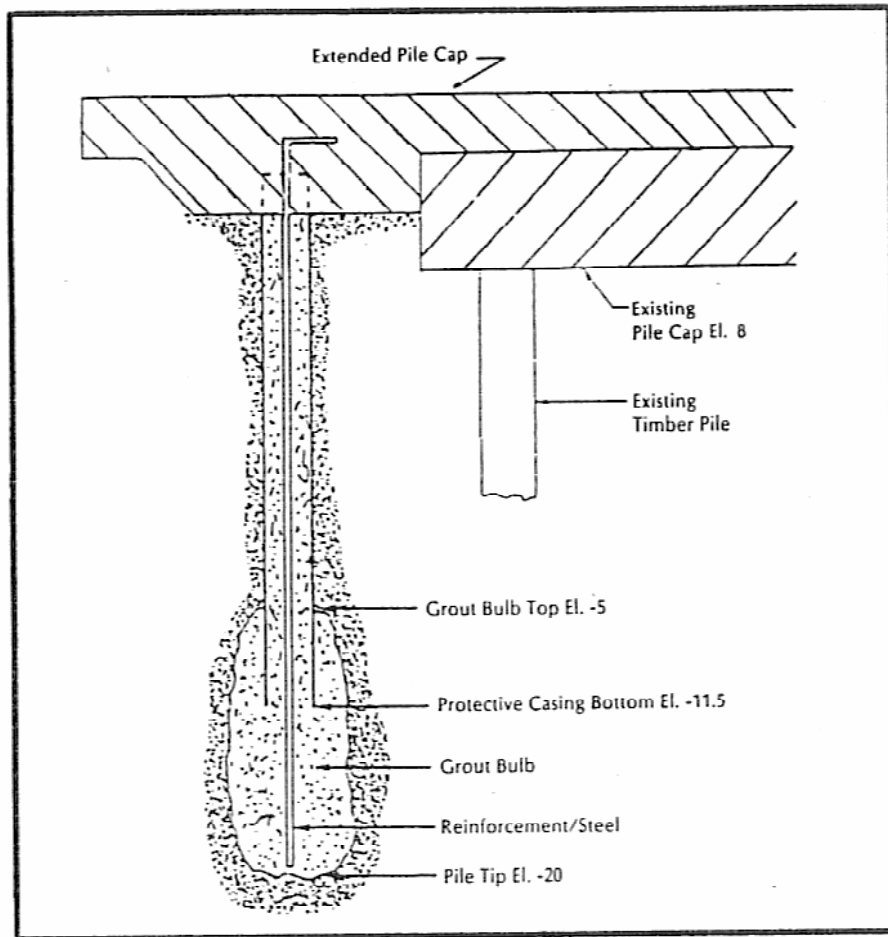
General arrangement of pin piles. Boylston Street, Boston. (Bruce, 1988)
